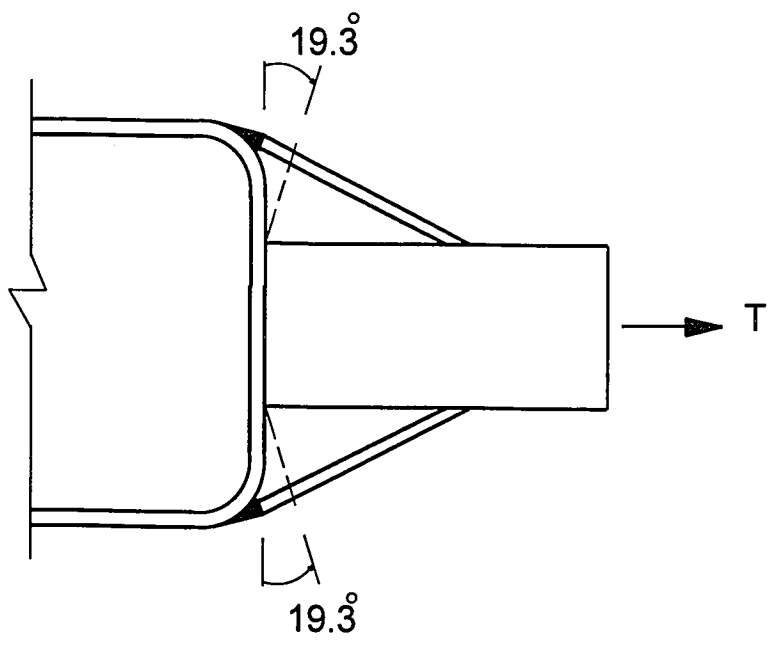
Section Resisting One Half of Flange Force, Specimen 3
